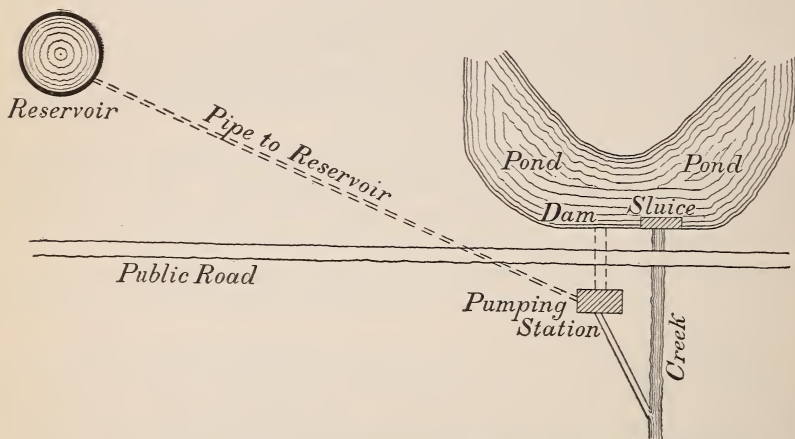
Irrigation plant on the farm of T. H. Whitney, Glassboro, N. J.
